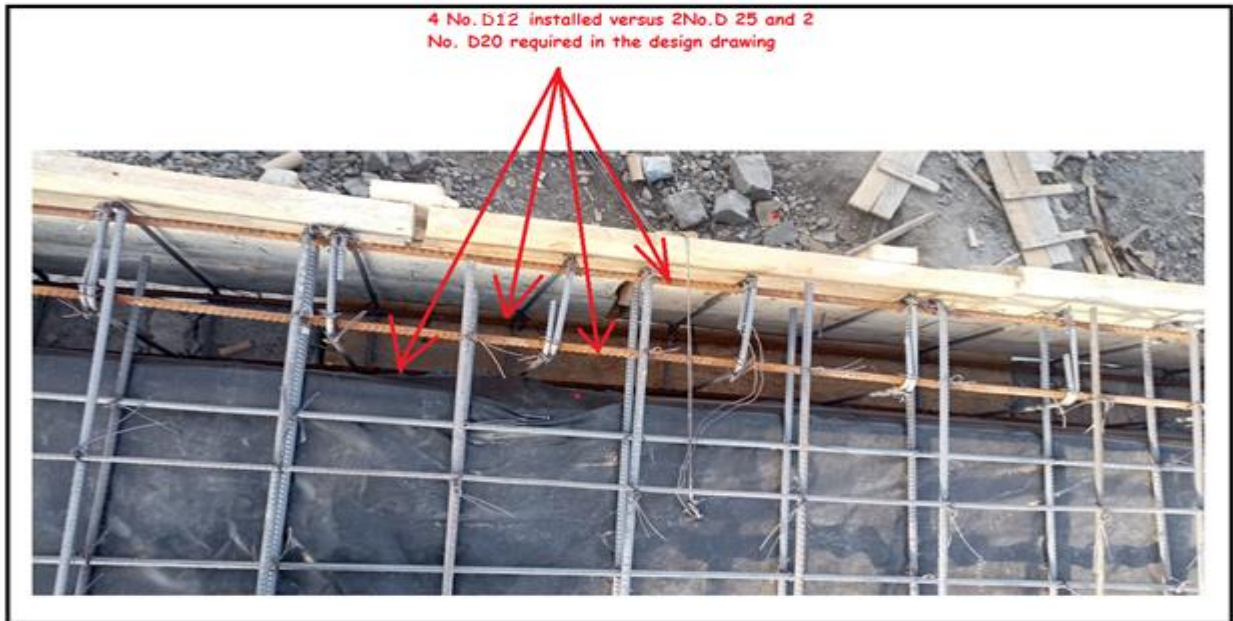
Case 2 -Installed beam reinforcement (4 No. D12)
